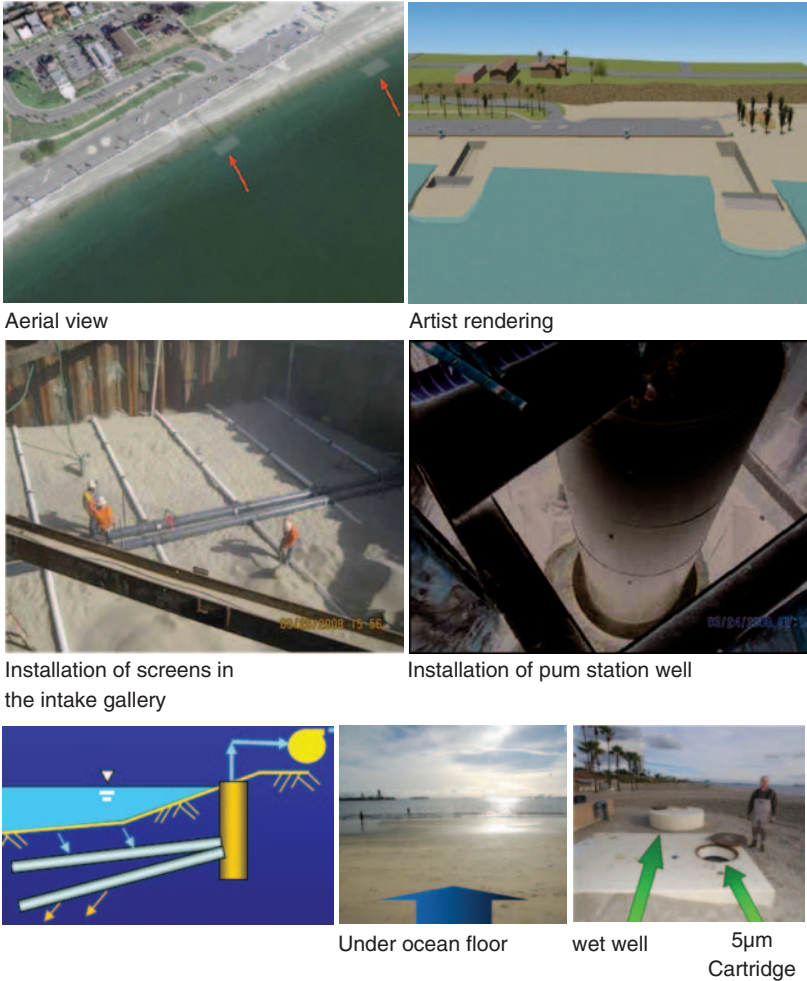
Site U: underocean floor intake–discharge system at Long Beach, California.
